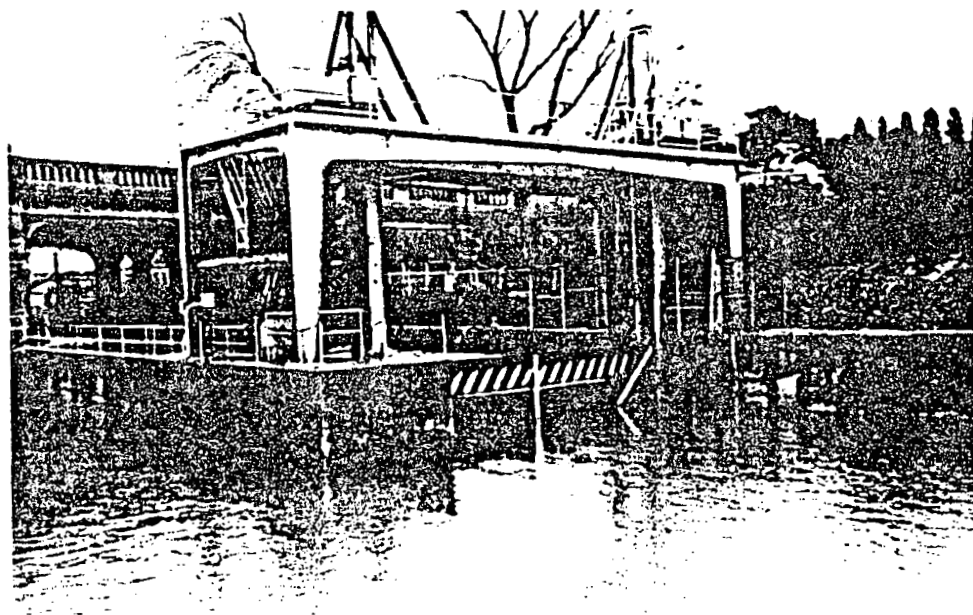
CANAL SIDE VIEW OF OLD LOCK
